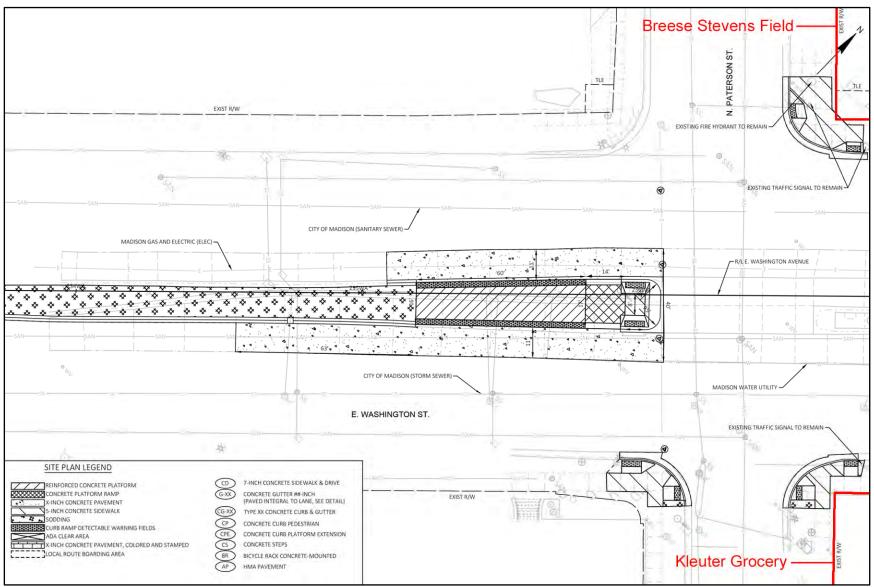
E. Washington Avenue at Paterson Street – Plan View of Proposed Median Station In Vicinity of Breese Stevens Field and Kleuter Wholesale Grocery Warehouse
